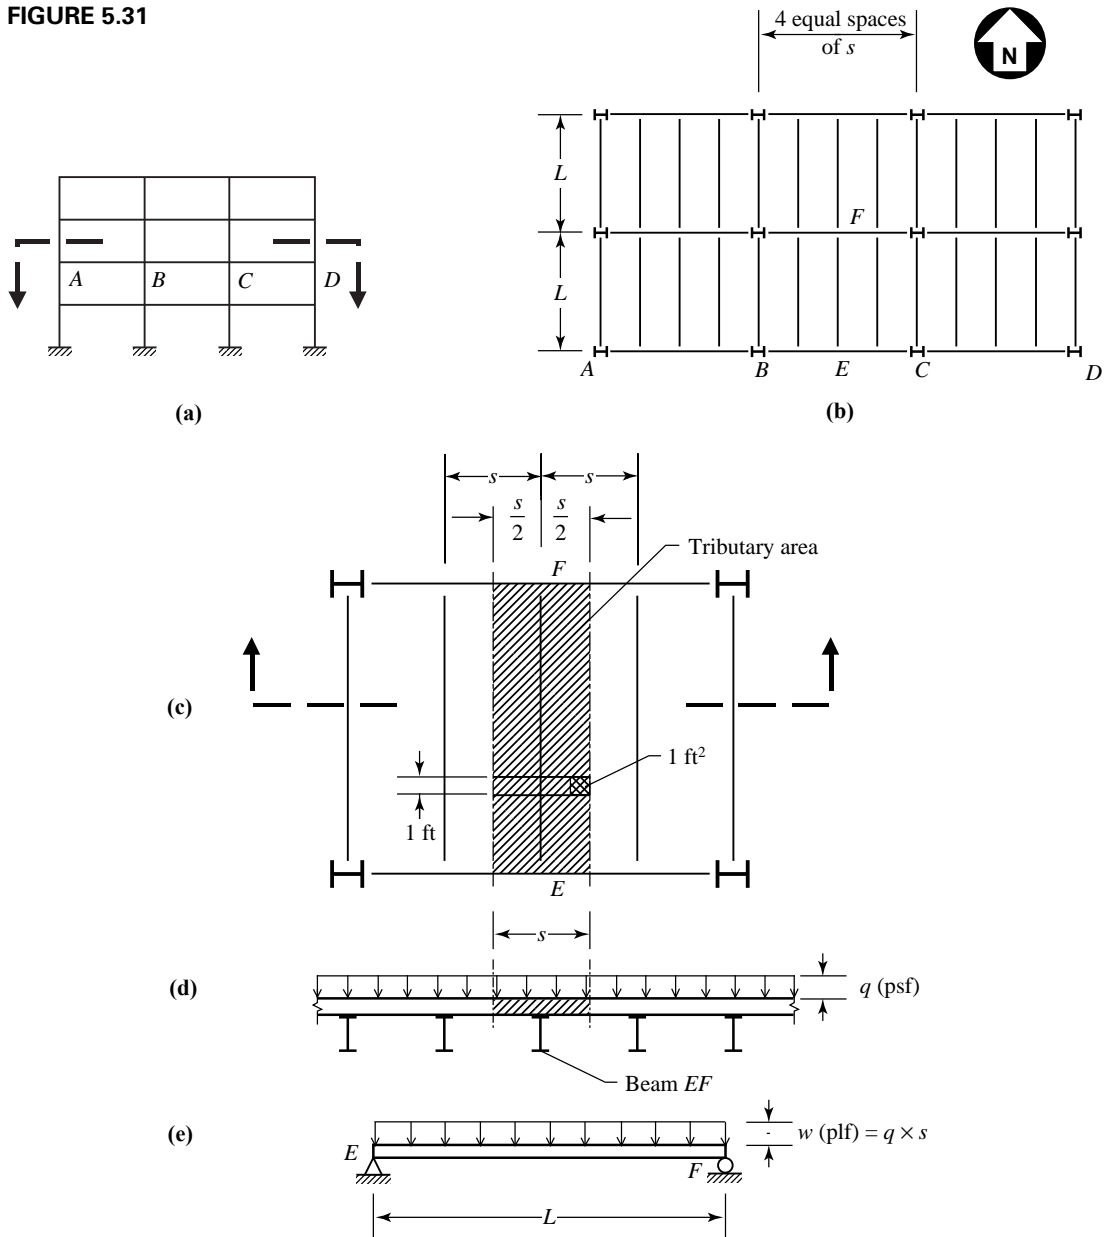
(c) shows a shaded area around floor beam EF . This is the tributary area for this member, and it consists of half the floor between beam EF and the adjacent beam on each side. Thus, the total width of floor being supported is equal to the beam spacing s if the spacing is uniform. If the load on the floor is uniformly distributed, we can express the uniform load on beam EF as a force per unit length (for example, pounds per linear foot [plf]) by multiplying the floor load in force per unit area (for example, pounds per
